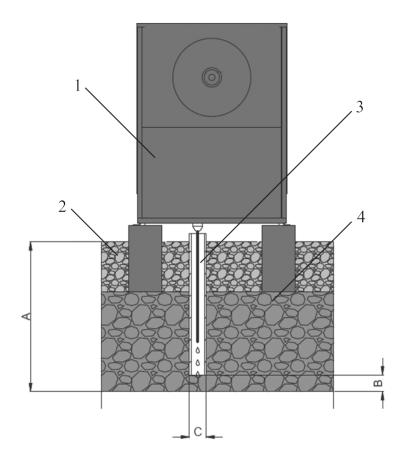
Heat pump position and assembly. 1 – Heat pump; 2 – Absorbent subbase (gravel); 3 – Pad foundation; 4 - Stone, crushed stone
